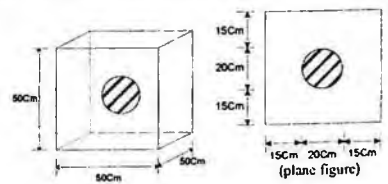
Non-reinforced concrete structure blocks (plane-shaped and V-shaped joint voids)
